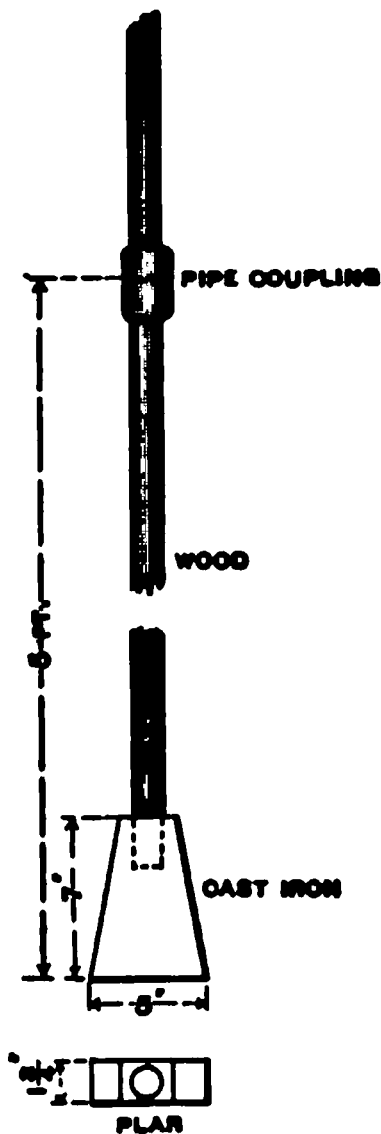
Rammer for Mushy Concrete. (See p. 373.)
